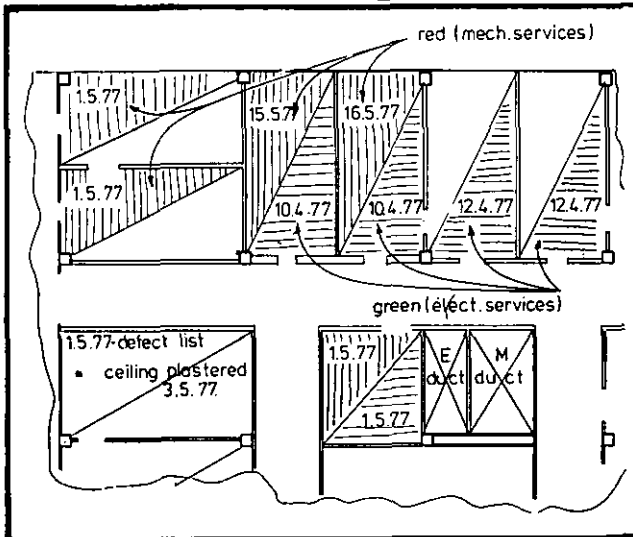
Stage inspection of rooms E and M (eg — above ceilings).
